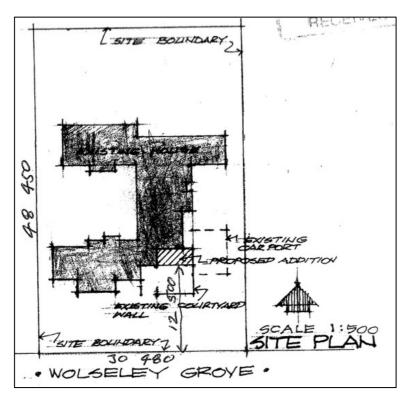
Site plan from 1985 Building Permit, showing the addition made to the south east corner of the façade at that time. (permit sourced by property owner)
